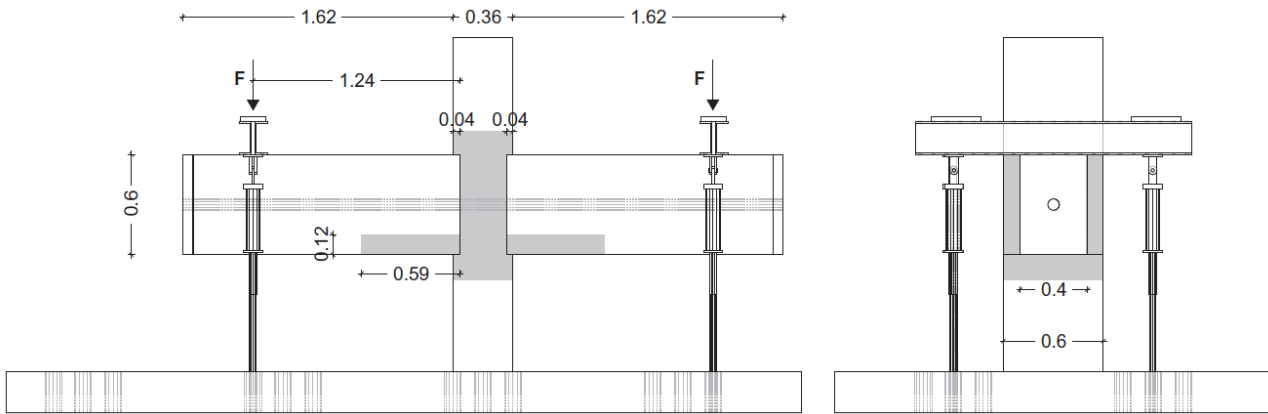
Test set-up for a post-tensioned connection at ETH Zurich – Source: [164]
